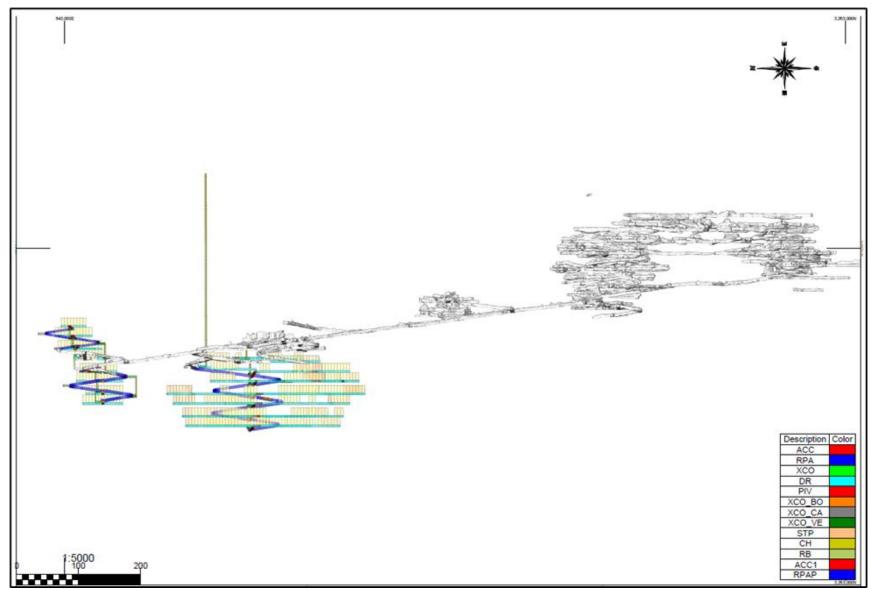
Isometric long section looking north-east showing the Klondike/Rey de Oro deposit as-builts and reserve locations
